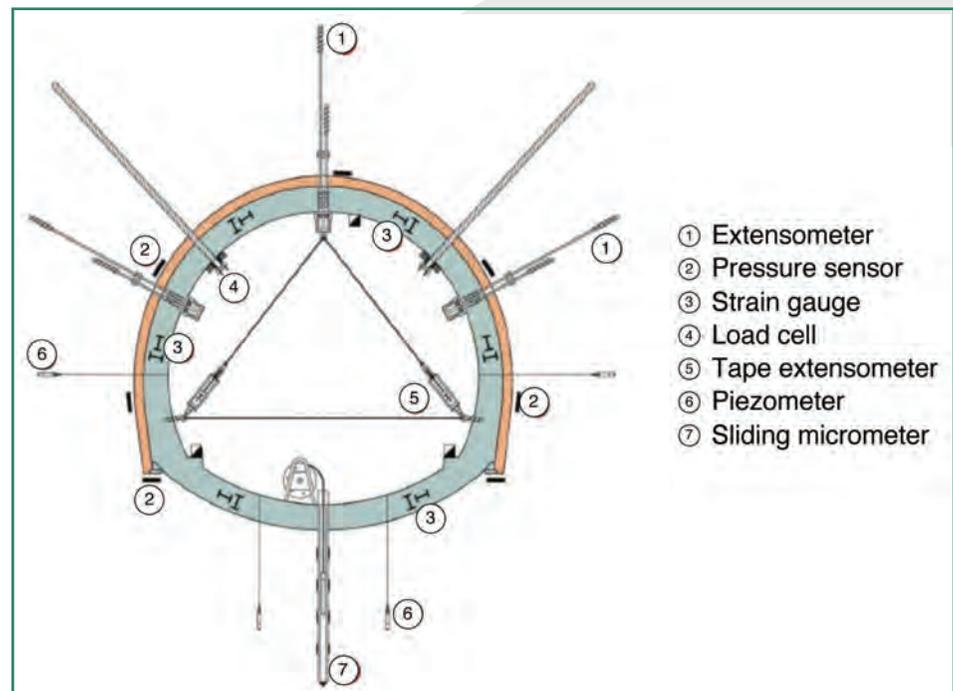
Typical layout of instrumentation (after ITA-CET 2009)
